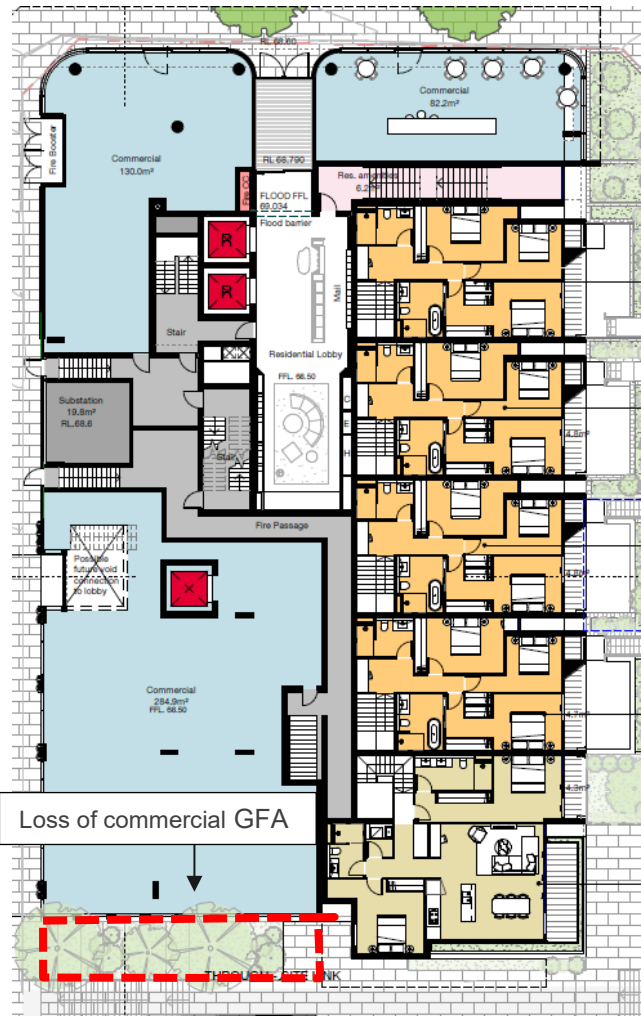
DA Submission and Amended Design Upper Ground Floor Plans
